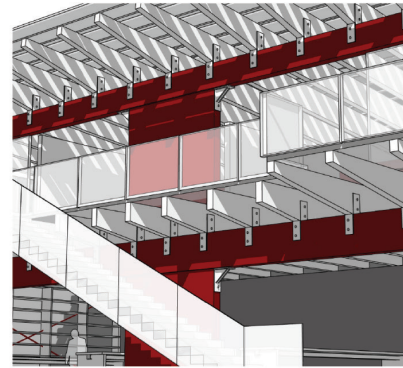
and 3.1.28b Framing diagram of CLT floor and wall panel installation—typically with wood-to-wood connections. The CLT can be topped with a thin slab of concrete if needed or finished at the edges with steel
